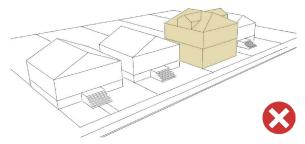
The site placement of the new building does not respect the setbacks of the adjacent contributing buildings.
